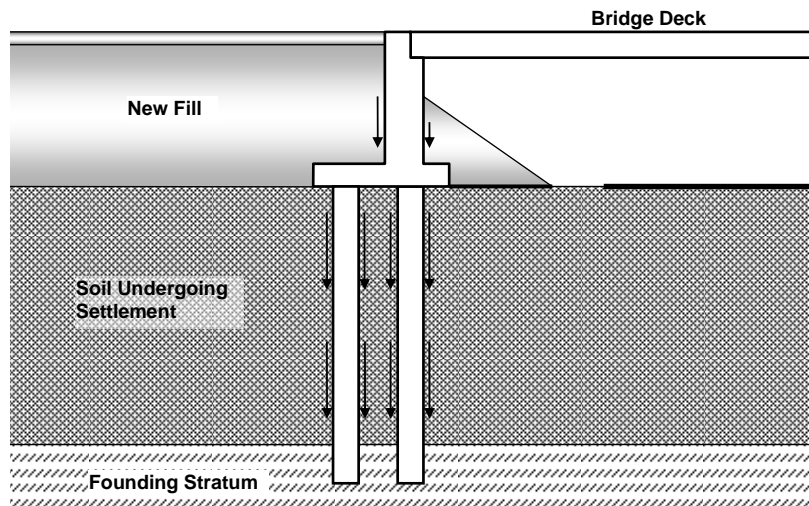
Common Sources of Downdrag at Drilled Shaft Supported Bridge Abutments
